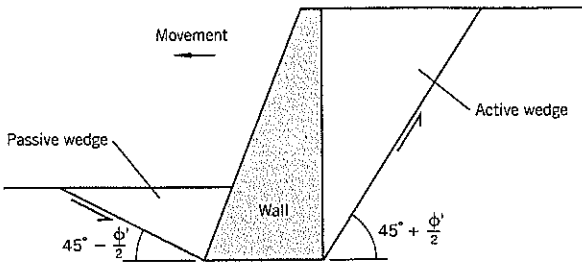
Development of active and passive wedge failures due to outward movement of a smooth retaining wall.
